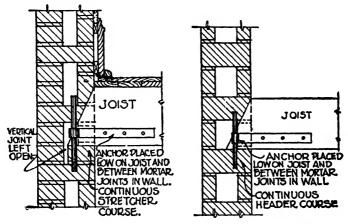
,343.—Concealed joist support forming fire stop in 8 in. hollow Ideal wall, Fig. 4,344.—Placement of joist anchor in 8 in. hollow, all rolok wall.
